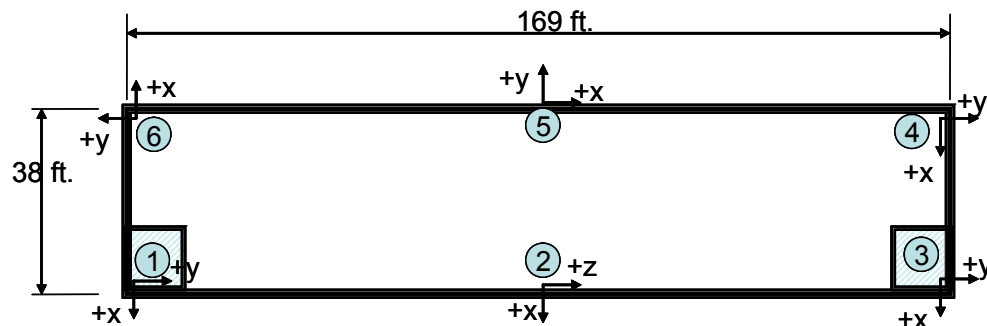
Plan of Building 216 with Sensor Locations at the Attic Level
